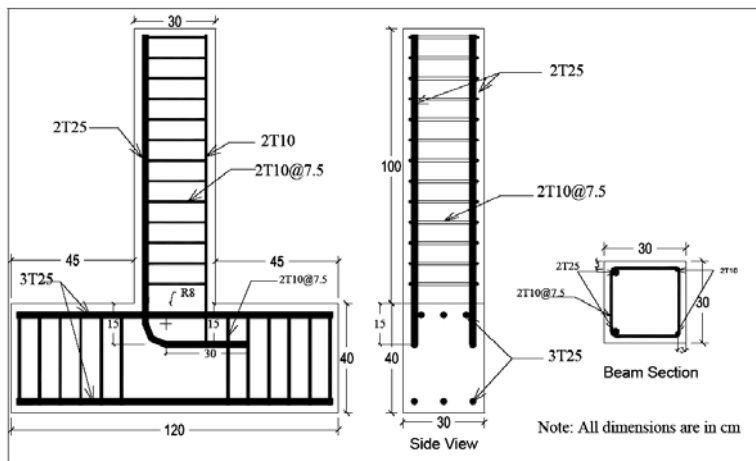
Details of the beam-column specimen U25H; unconfined anchorage mode, 25-mm beam bars.
